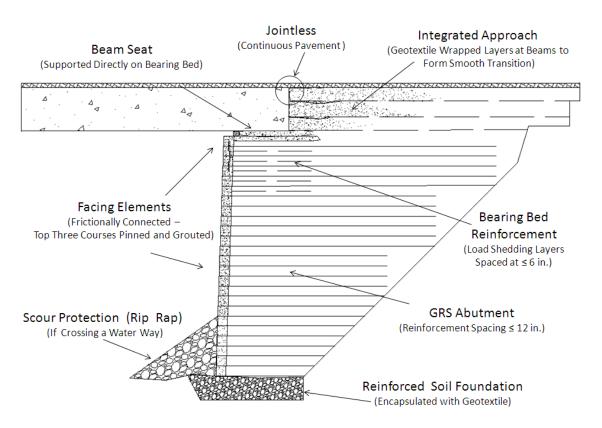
Typical Section of a GRS/IBS Bridge Abutment
